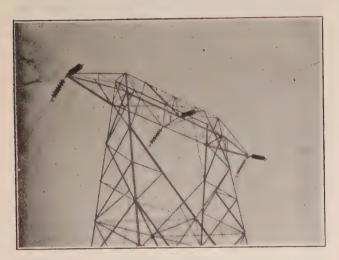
LINE DAMAGE, TOWER NO. S21, LOOKING NORTHWEST
